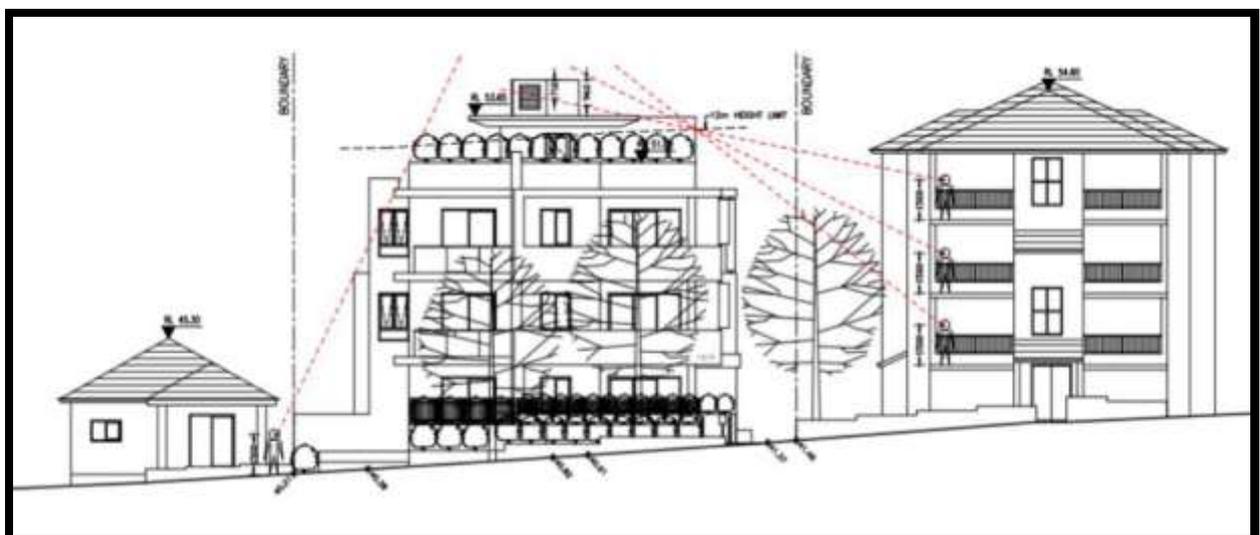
View lines extending along George street to show the visibility of the roof top structures (courtesy: BMA Urban, 2020)
